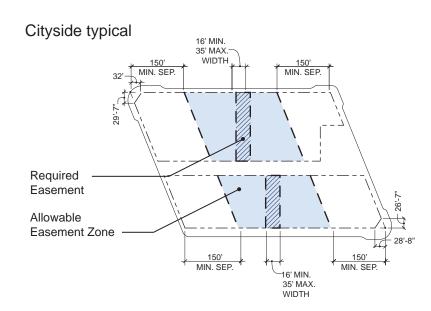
CITYSIDE TYPICAL BLOCK PLAN
